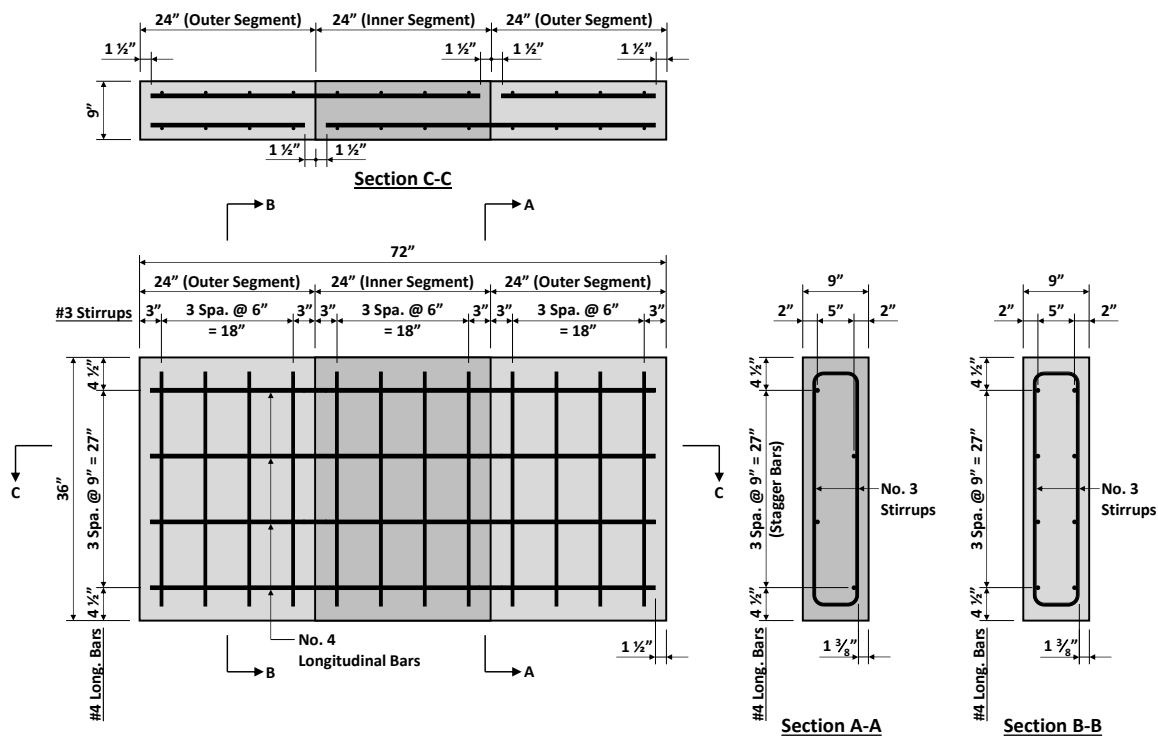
Reinforcement details of all Set 1 specimens and Specimens 2-4, 2-5, and 2-6 of Set 2
